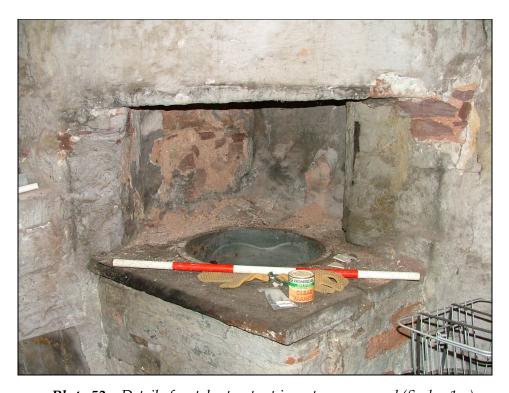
Detail of metal set-pot set in a stone surround (Scale =1m)
